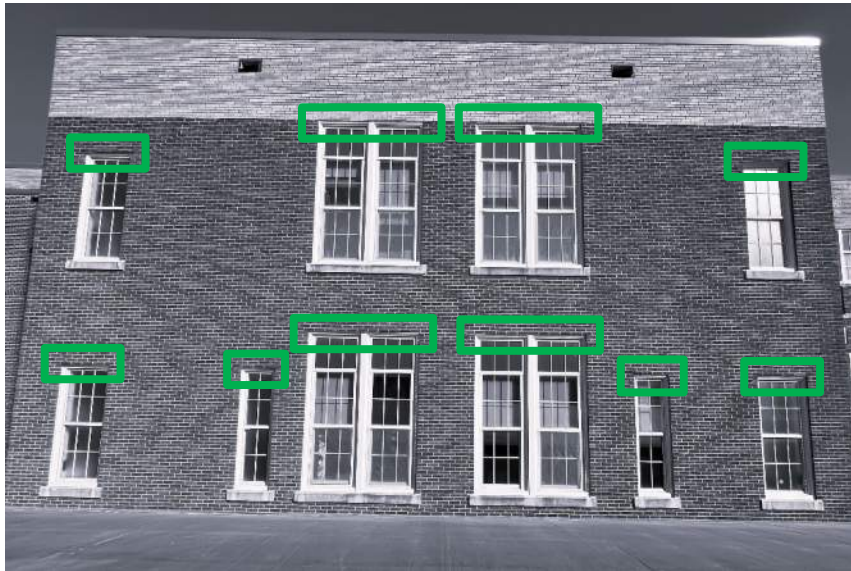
& 7: South/Southeast Façade – Masonry failure locations
